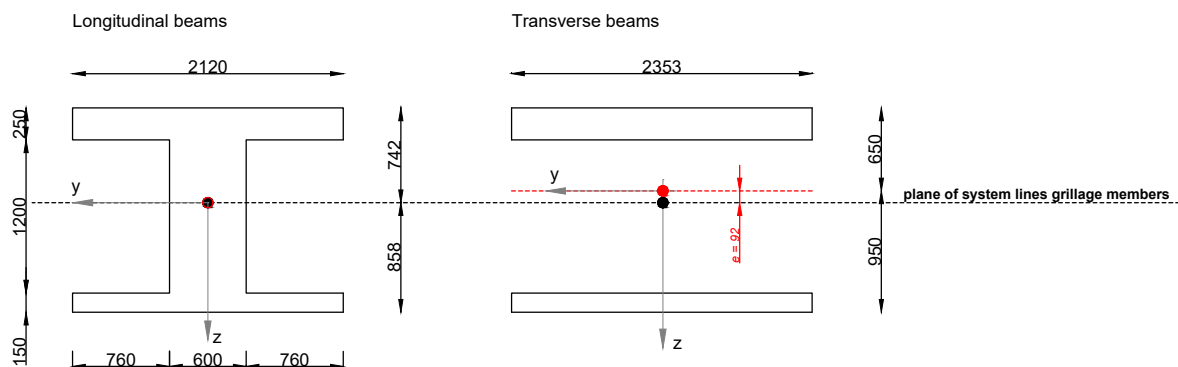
Cross-section longitudinal and transverse beams grillage model (mm)
